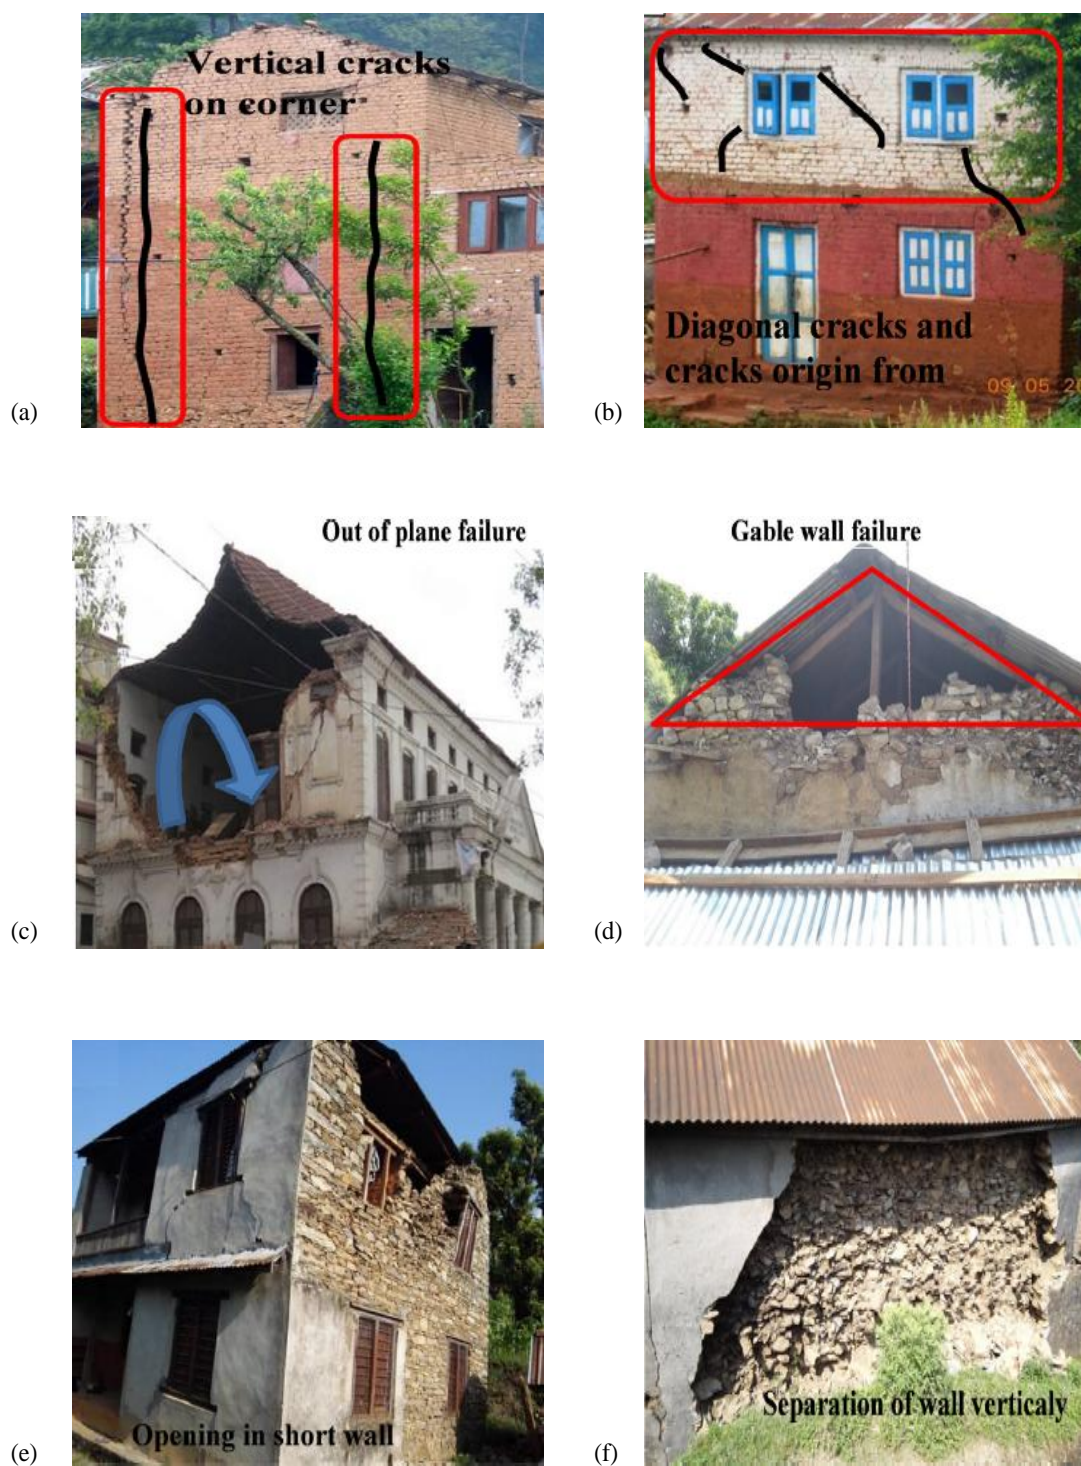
Conventional masonry failures; (a) Vertical cracks near the corner, (b) Crosswise cracking initiated from edges of the openings, (c) Out of plane failure, (d) Gable wall failure, (e) Opening in short wall, (f) Separation of wall vertically [13].
